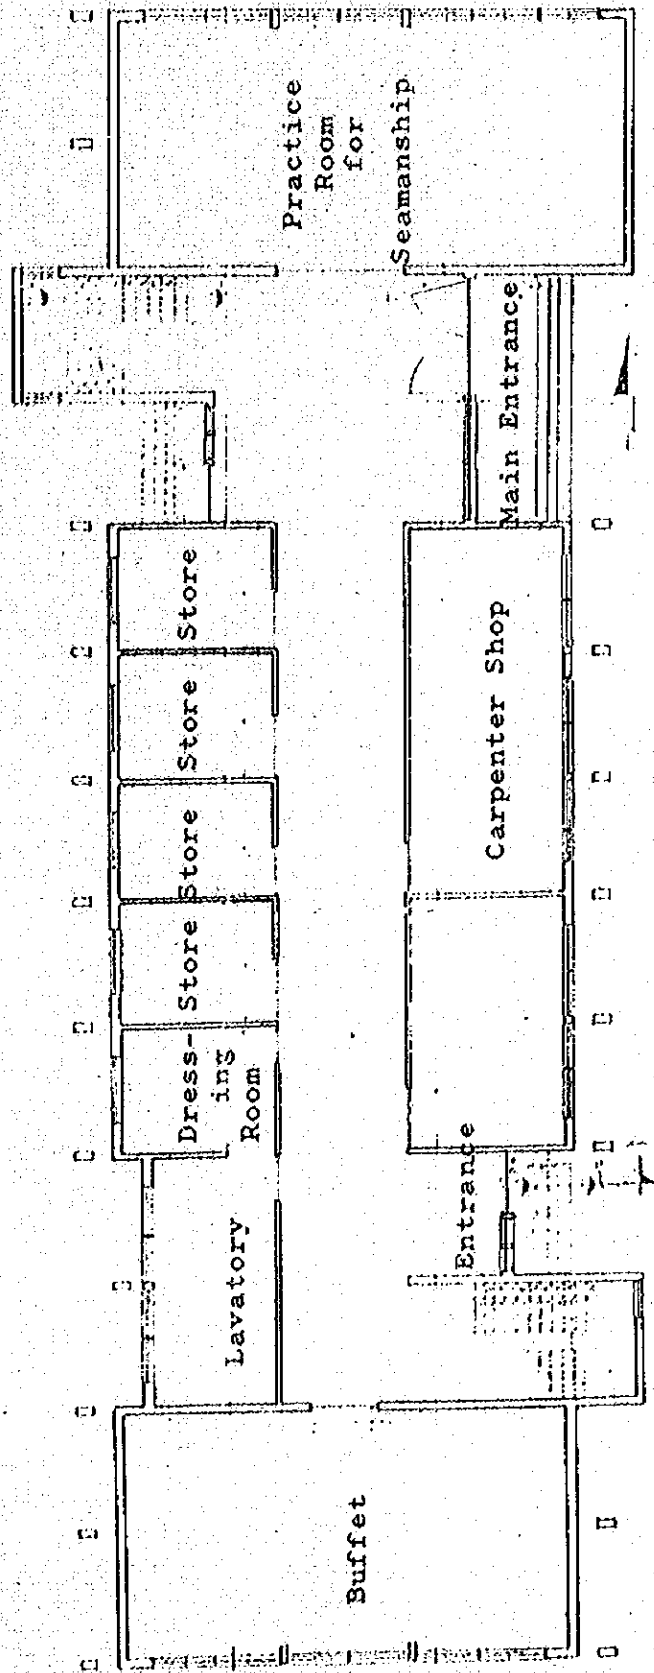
Plan of SSTC Educational Building (Ground Floor)
